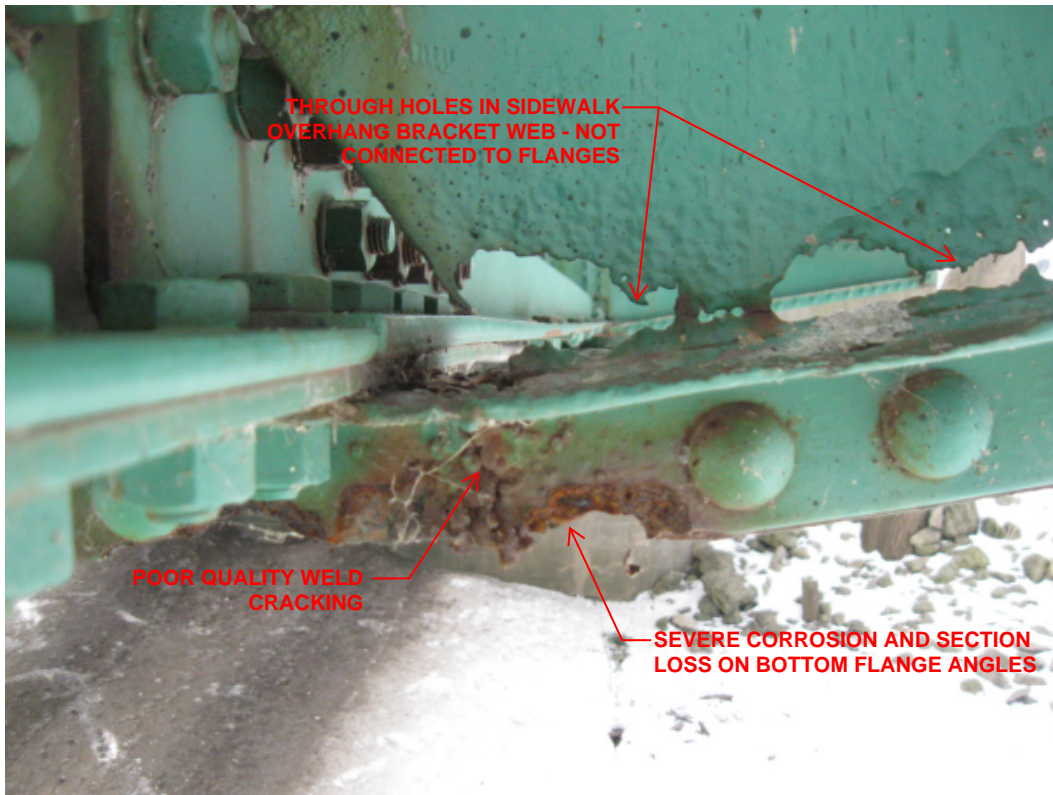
Side View of Sidewalk Overhang Bracket Deterioration
